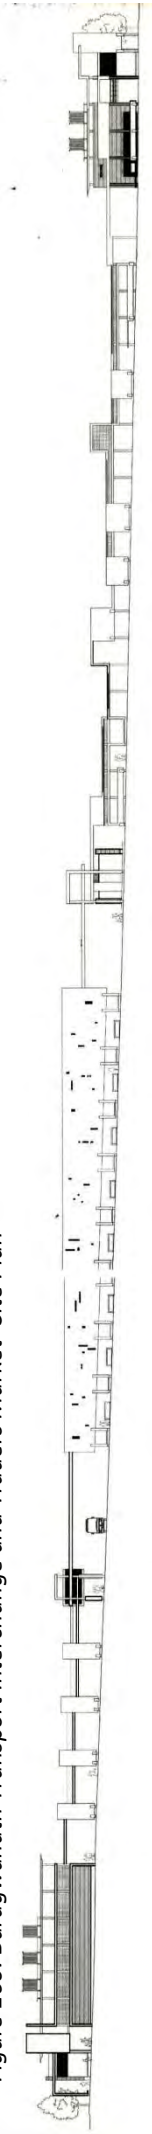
Baragwanath Transport Interchange and Traders Market- South Elevation
